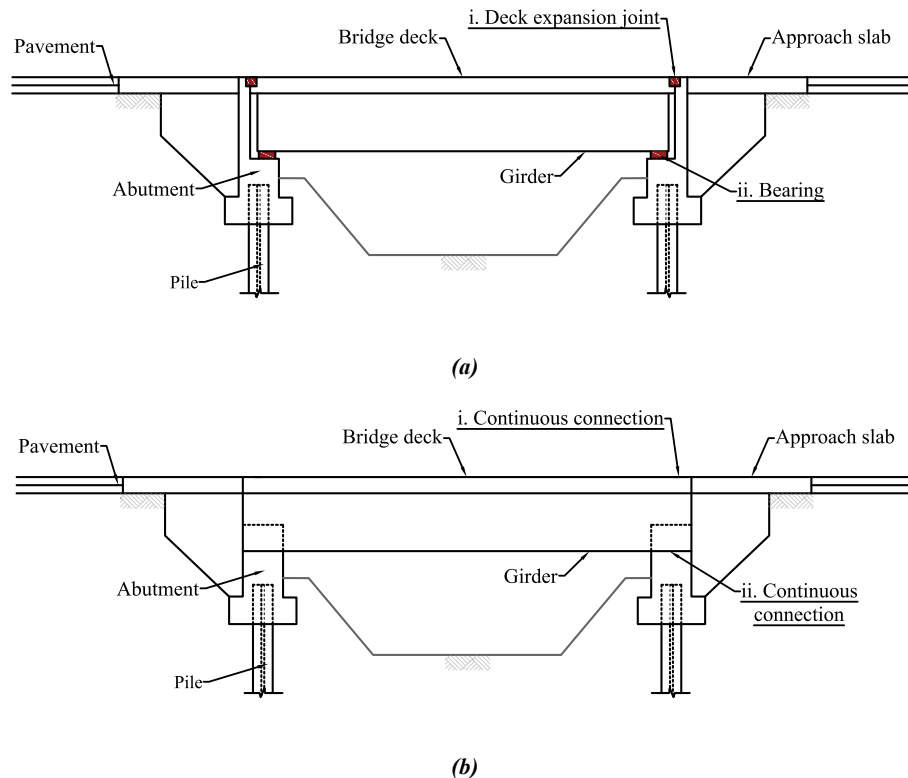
Schematic example of (a) traditional jointed bridge and (b) integral abutment bridge.
